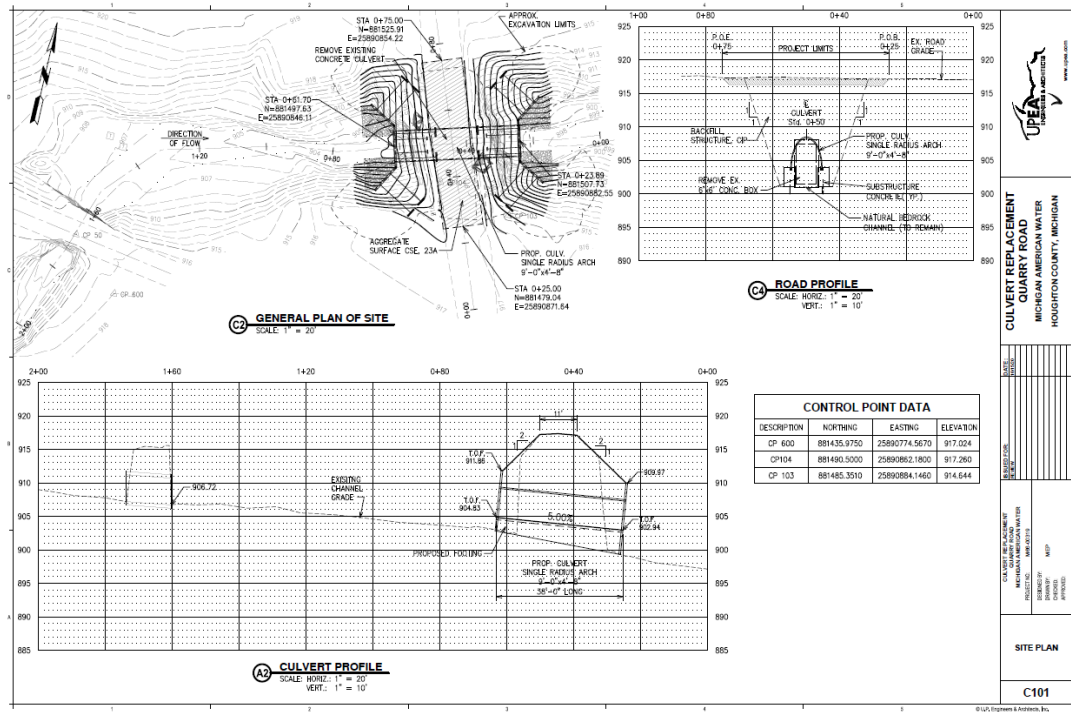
UPEA Quarry Creek at Quarry Rd Culvert Site Plan [18].
